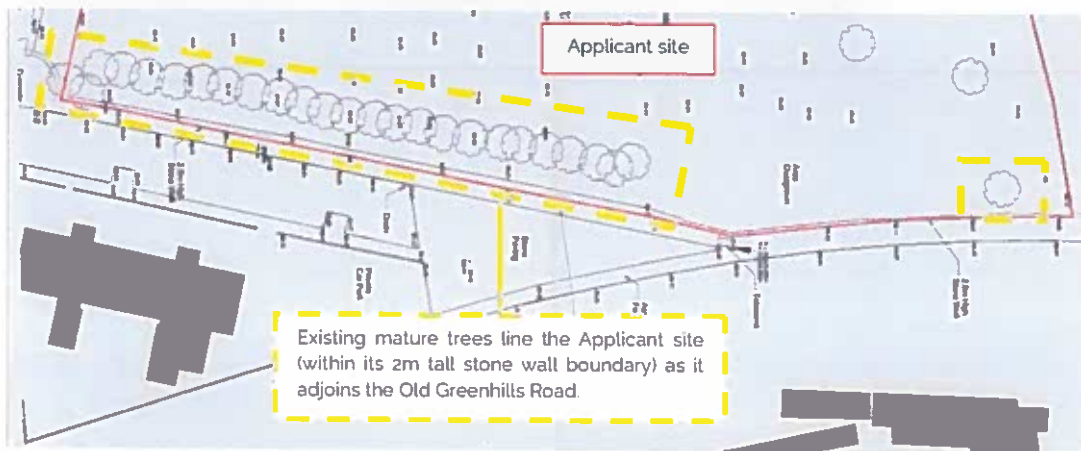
The locations of existing mature trees inside the Old Greenhills Rd site boundary
